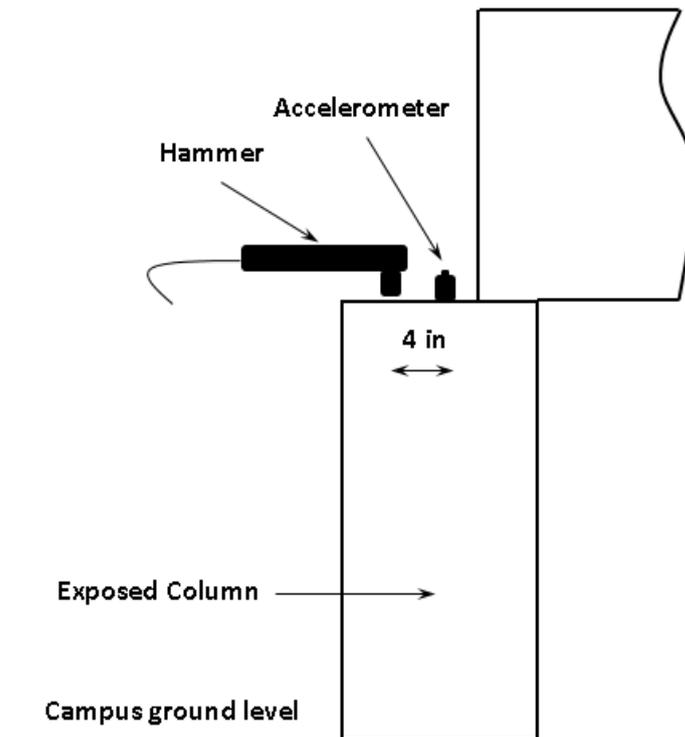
IR test setup for the steel-concrete composite column of centennial library on UNM campus
